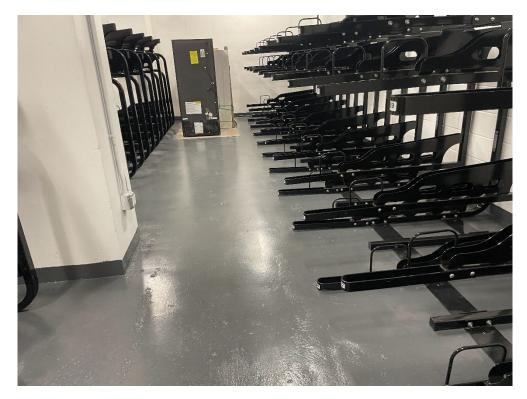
Photo of the concrete slab in the bike storage room in the Site's cellar.
